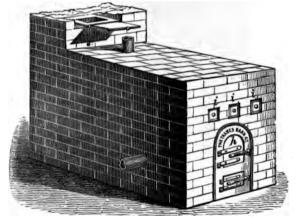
Gold Medal Boiler (brickwork setting). set in brickwork, which is shown in elevation in fig. 38. The ash-
